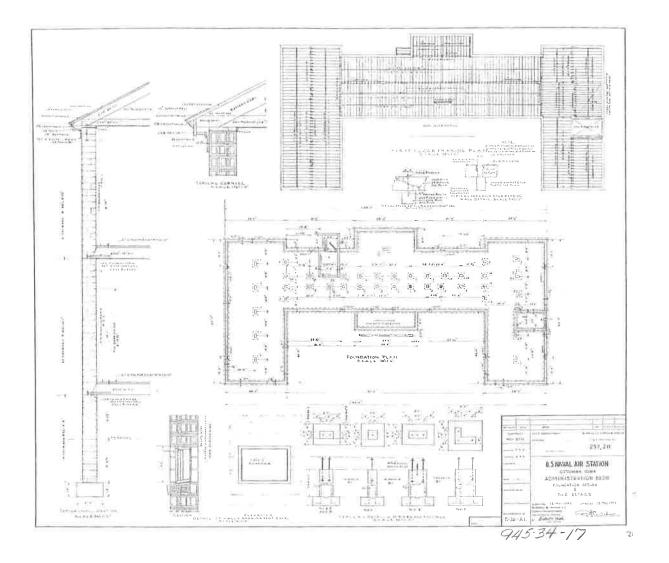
Drawings showing structural systems, framing and masonry (Russell B. Moore Co., May 15, 1943)
